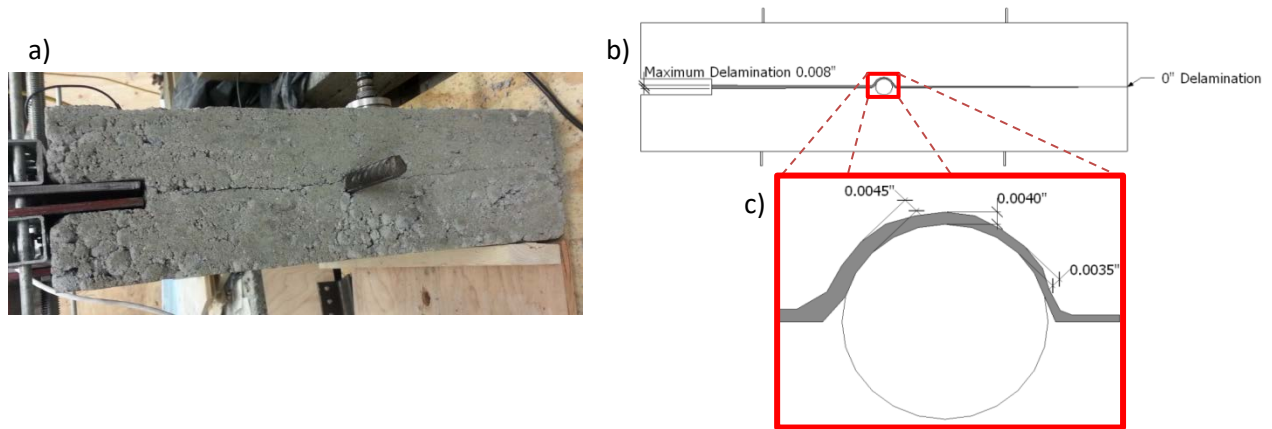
Estimation of delamination between rebar and concrete (Specimen set 1)
